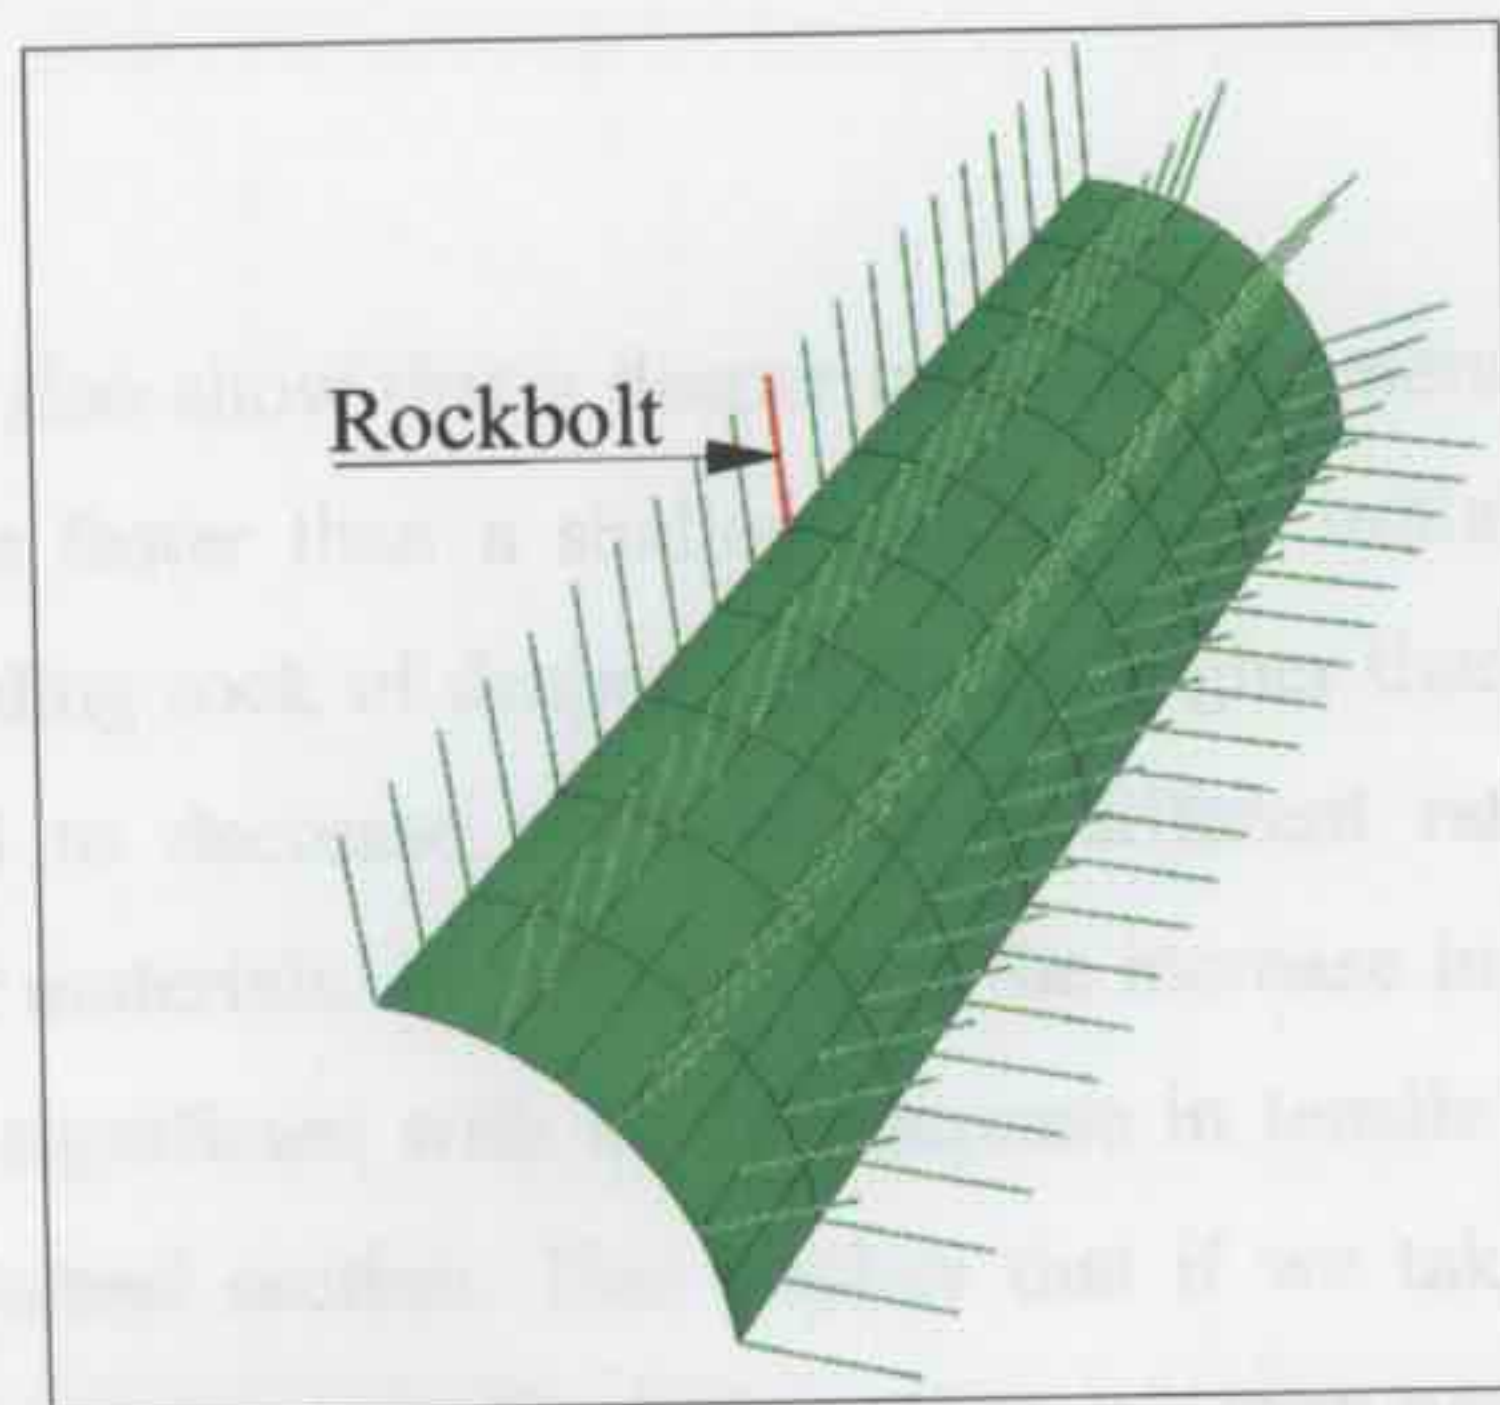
Rockbolt element in crown of Frejus tunnel section.
